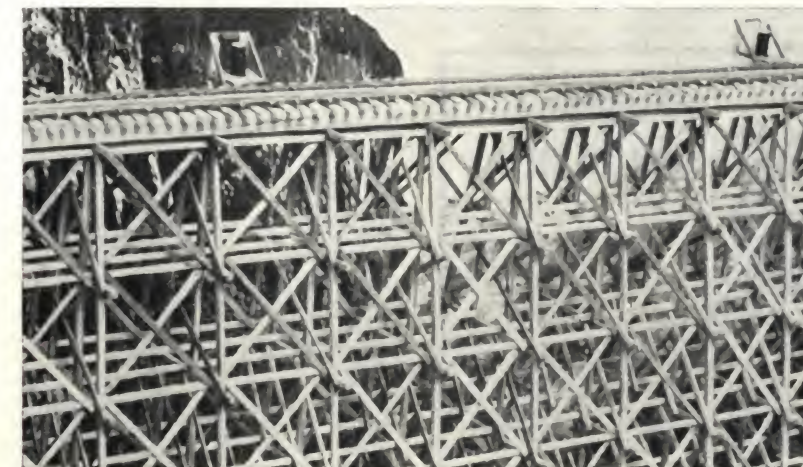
Chris Atherton built a different style of trestle bridge for his N scale US prototype 'Indian Head Loop Line'. Note how the design is modified to provide for a span to pass over the lower level track. The stone piers, culvert, and tunnel mouth were modelled using commercially available embossed plastic
